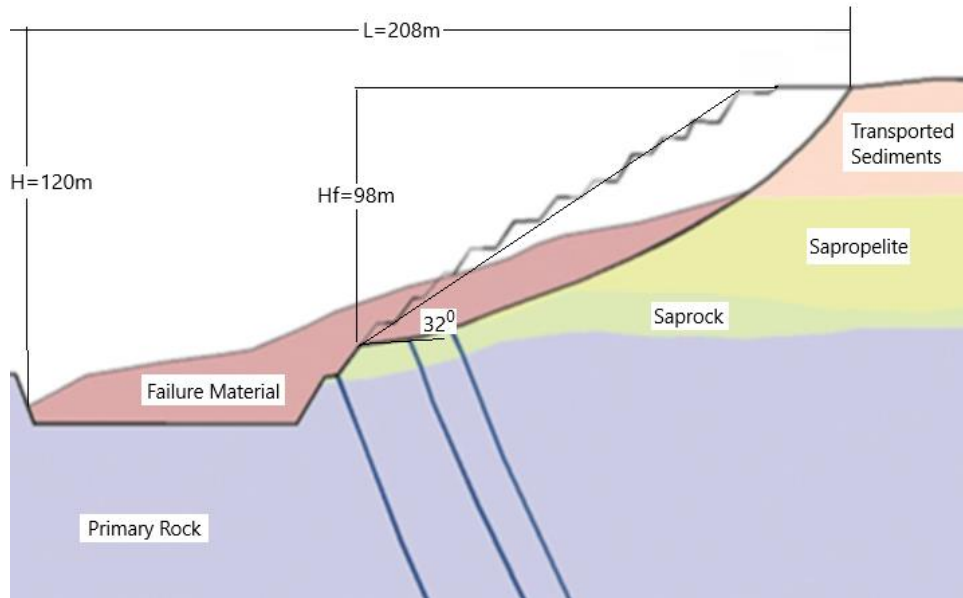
Cross section of the east wall failures at Cowal gold mine, Australia (adapted from Crouse and Wright 2015)
